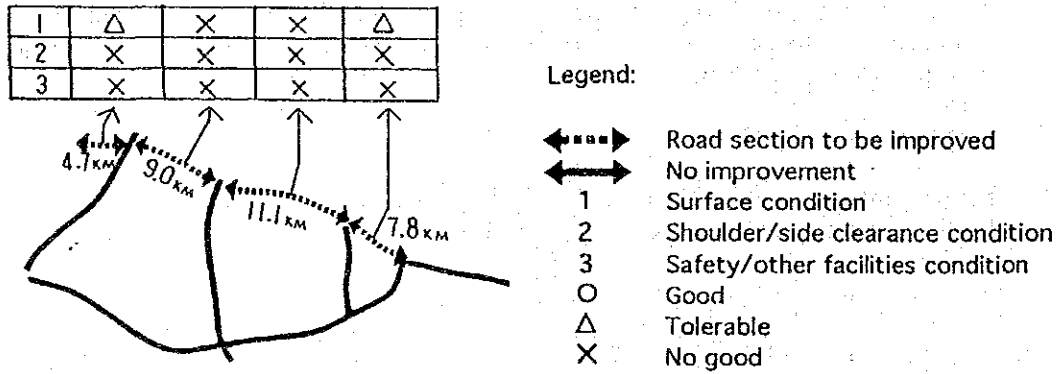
Existing Road Condition and Improvement Plan of Phetchaburi Coastal Road
